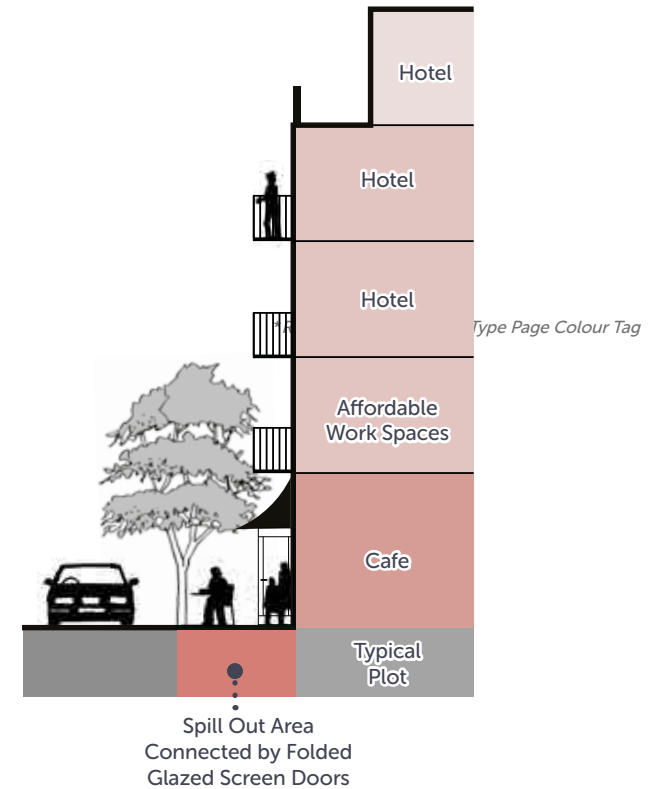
Street Section with Spill Out Area Connected by Folded Glazed Screen Doors
